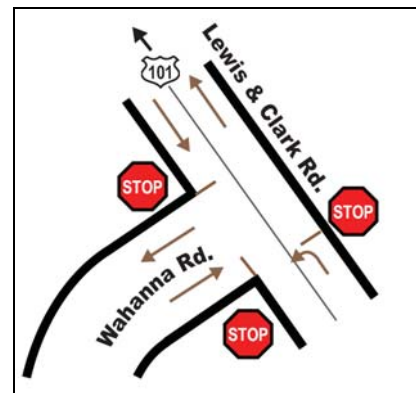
Lewis & Clark and Wahanna Road Intersection
